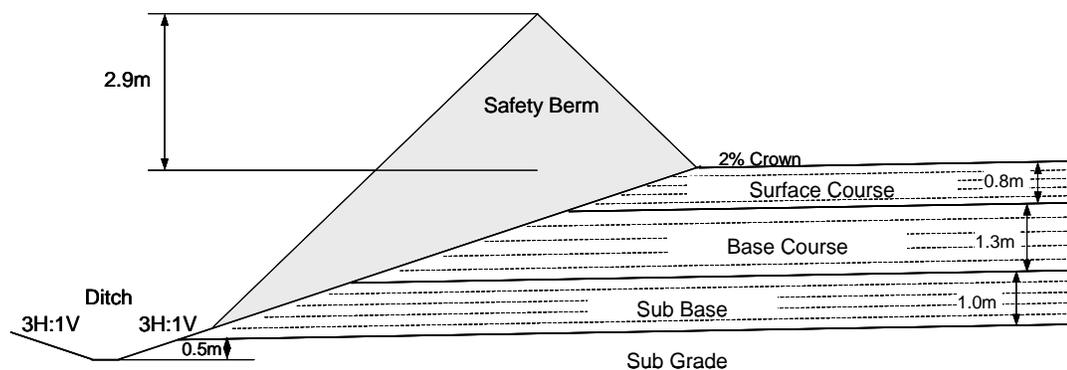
Typical haul road cross-section for 320t haul trucks.
